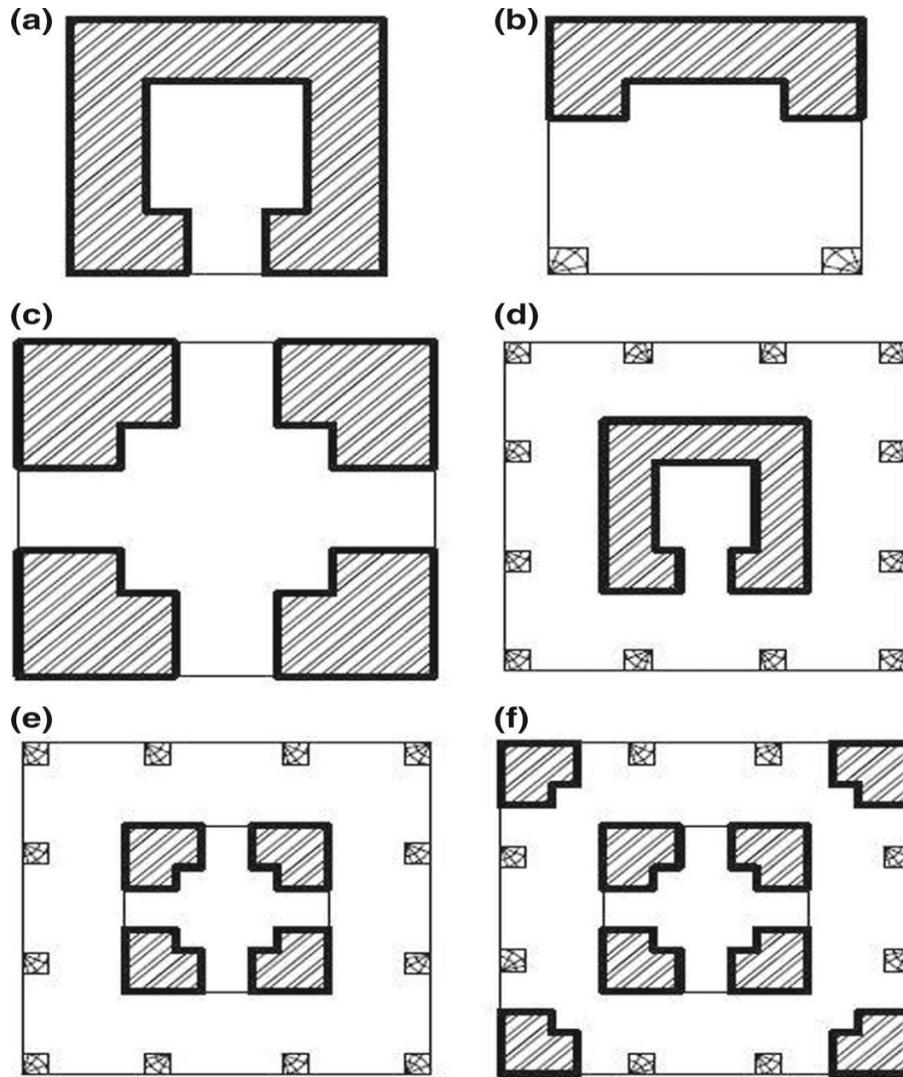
Wall system of Nepalese pagoda temples. (After Shakya et al. 2014)
